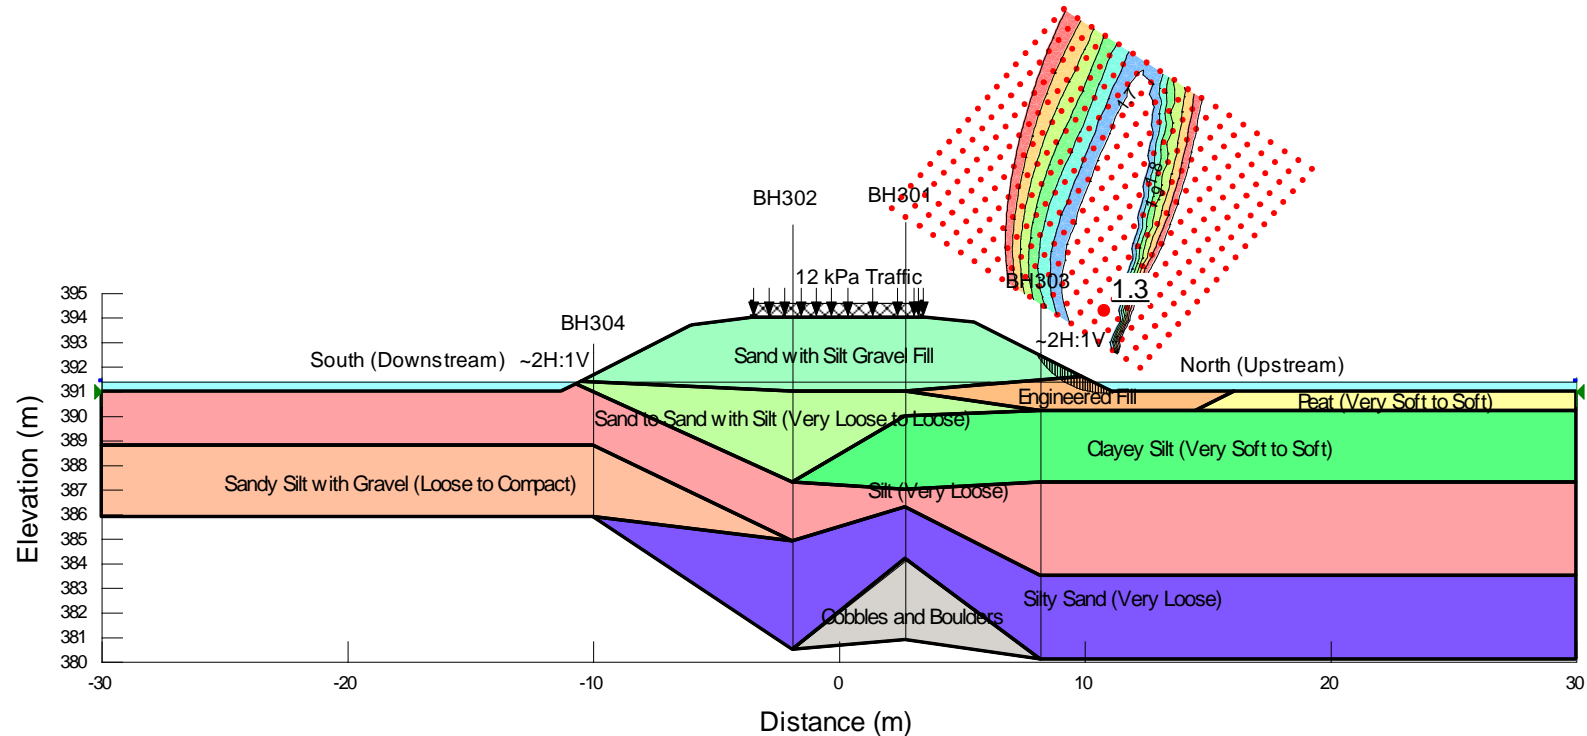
North embankment (upstream) – drained static condition with slope 2H:1V
